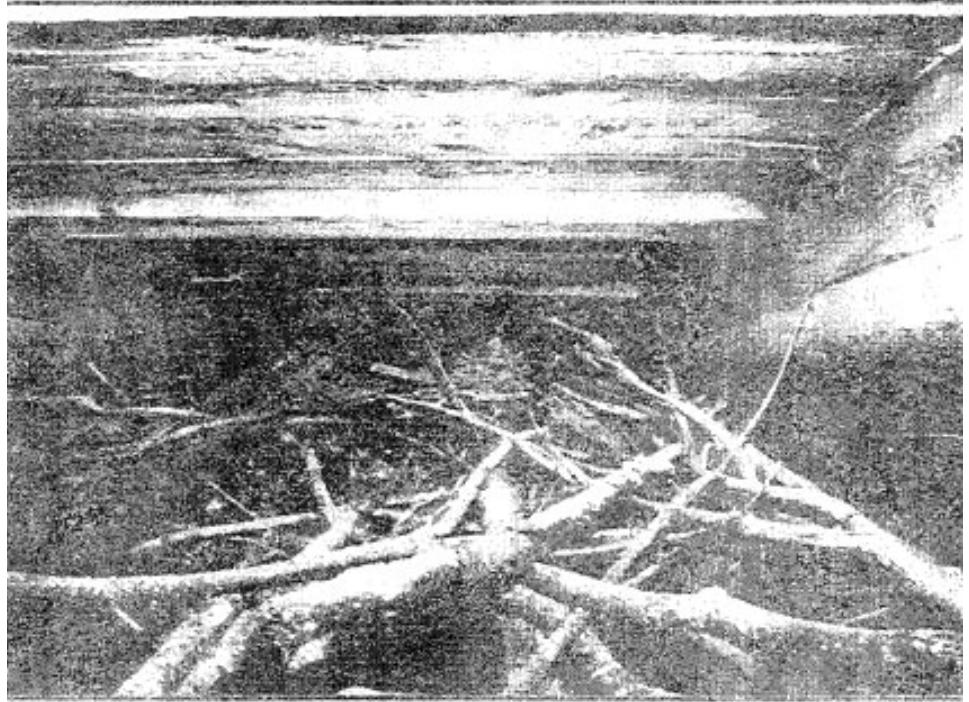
(Exhibit 65) Drift and Debris Inside Timber Box Culvert
